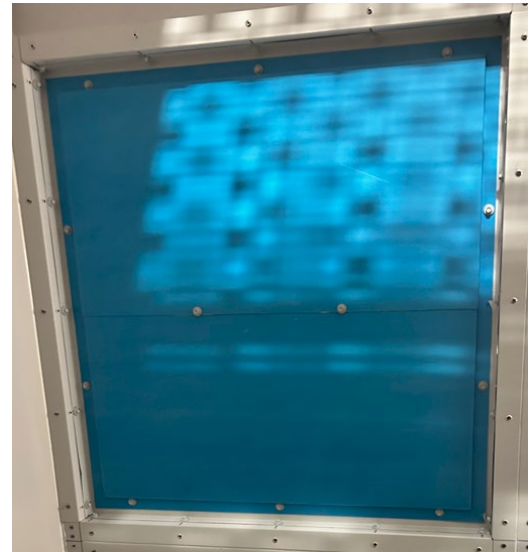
COMPLETED INSTALLATION SHOWING TWO PANELS
